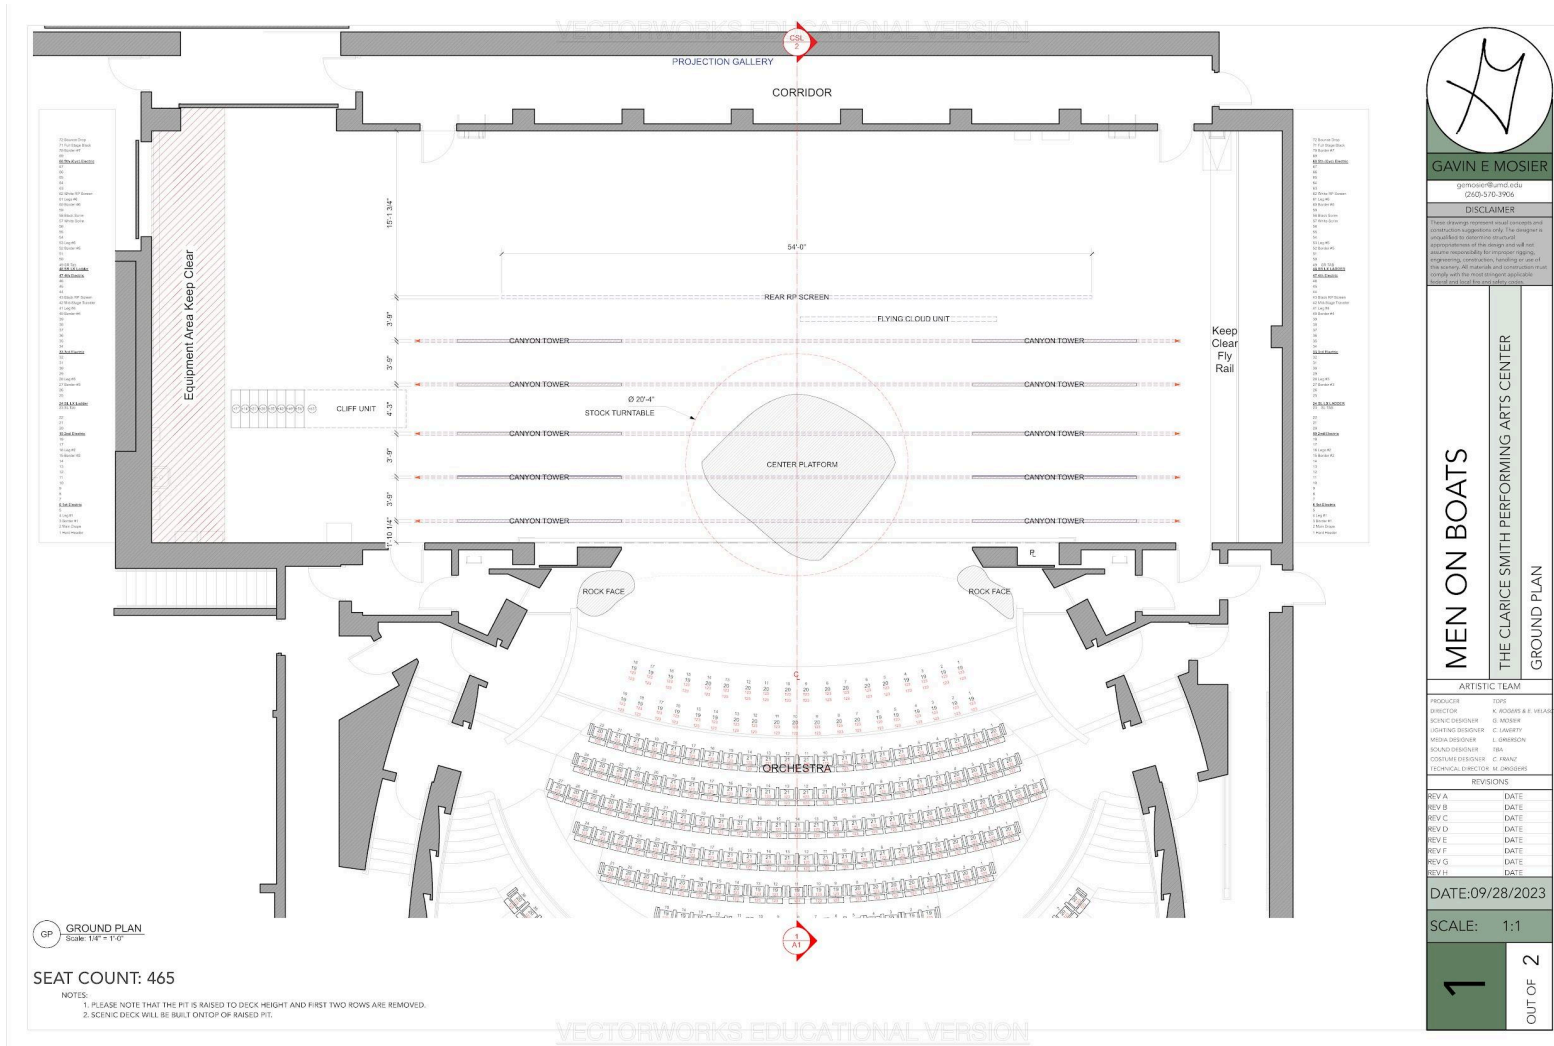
Drafting - rough ground plan. Drafting out of scale.
